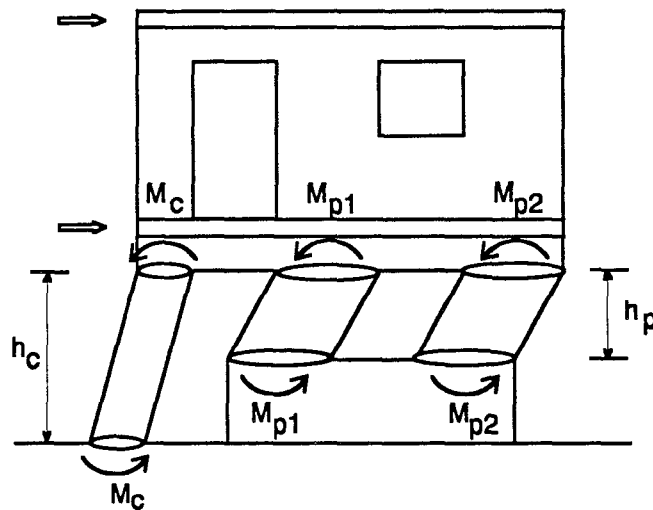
Forces acting on the collapse mechanism of the "pier-based" Specimen 1a.
